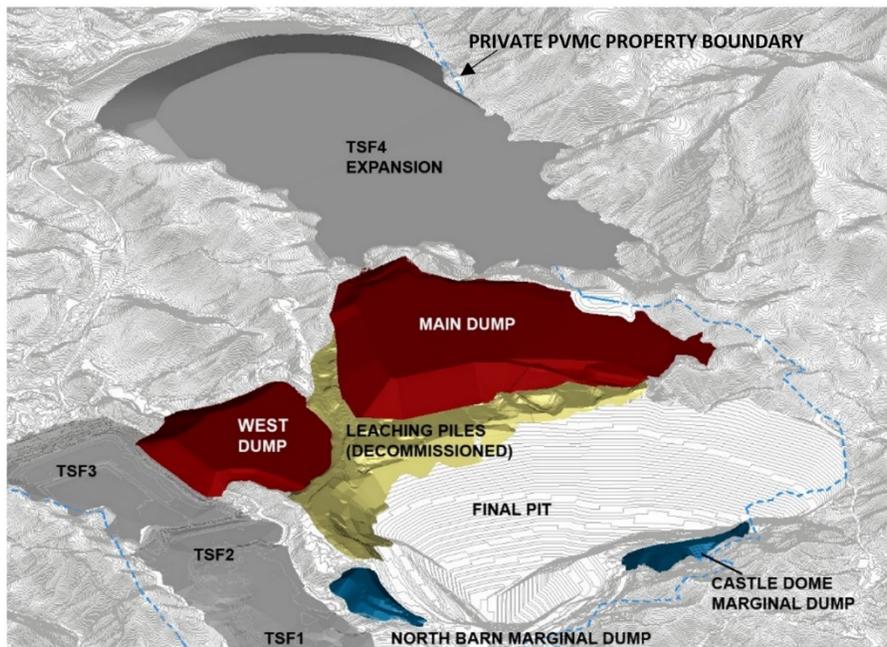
Perspective view looking north, -30 degrees at planned LOM waste rock, leaching, and tailings facilities. Future decommissioned LP (gold), existing and expanded tailings (gray), marginal grade dumps (blue) and planned LOM waste rock (red)
